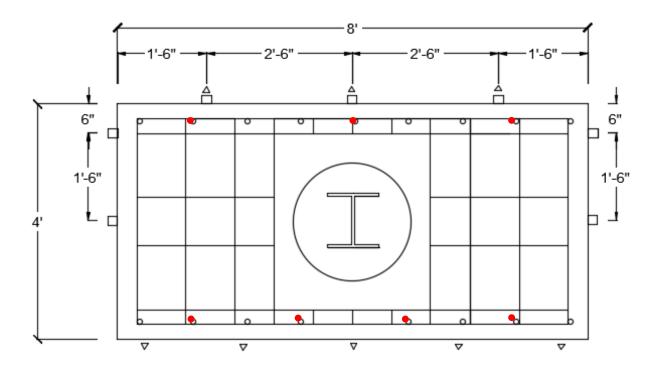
Grouted coupler and CIP instrumentation plan view for vertical loading
